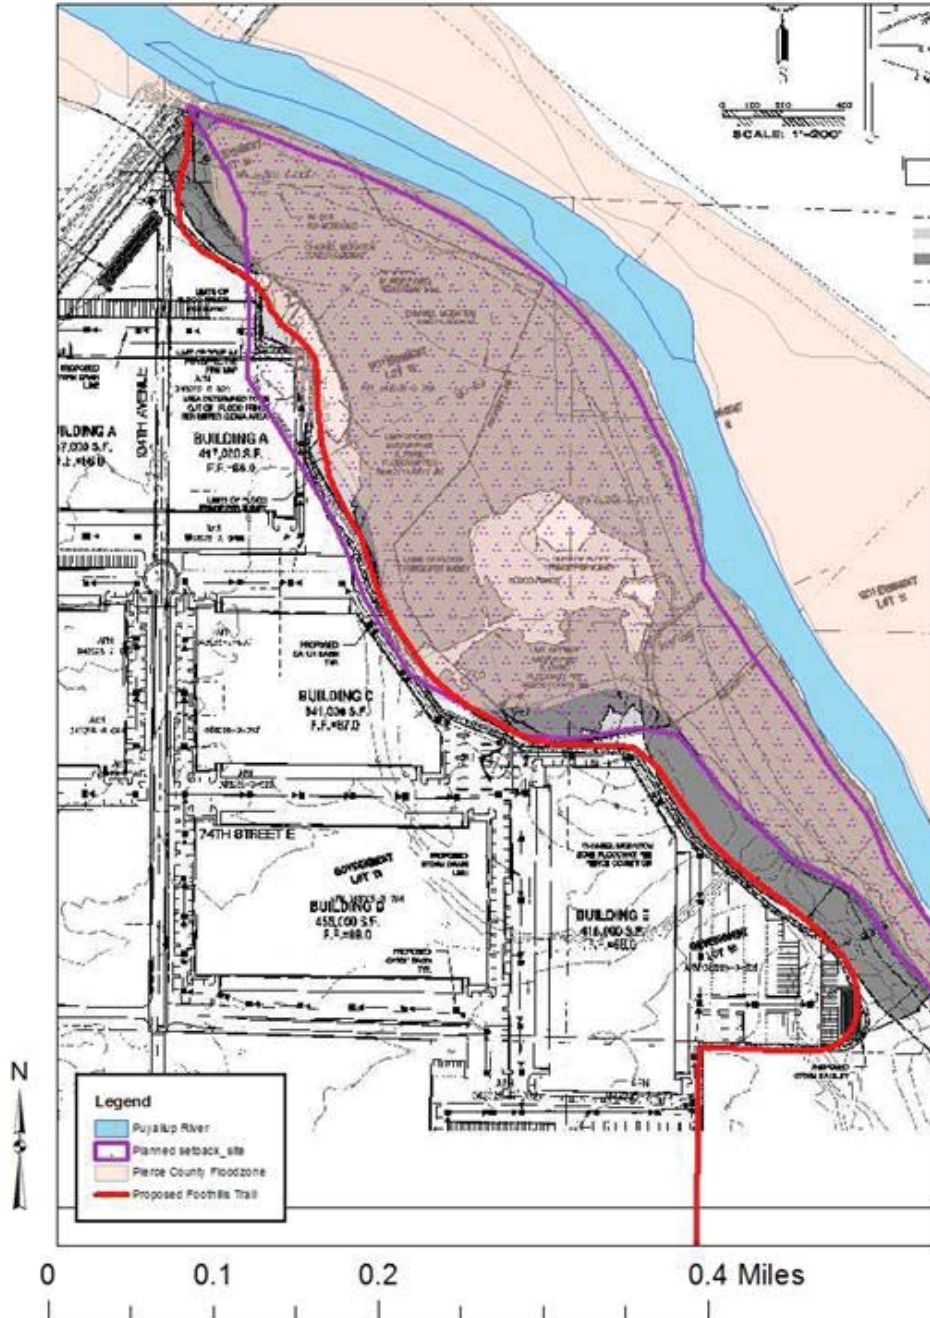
Knutson Farm Warehouse Site development plan shown with proximity to the Pierce County 100-year flood plain, the proposed the Sumner Levee Setback site (project #5 of Reinhart and Abbe 2014), and the currently proposed location of a pedestrian trail.
